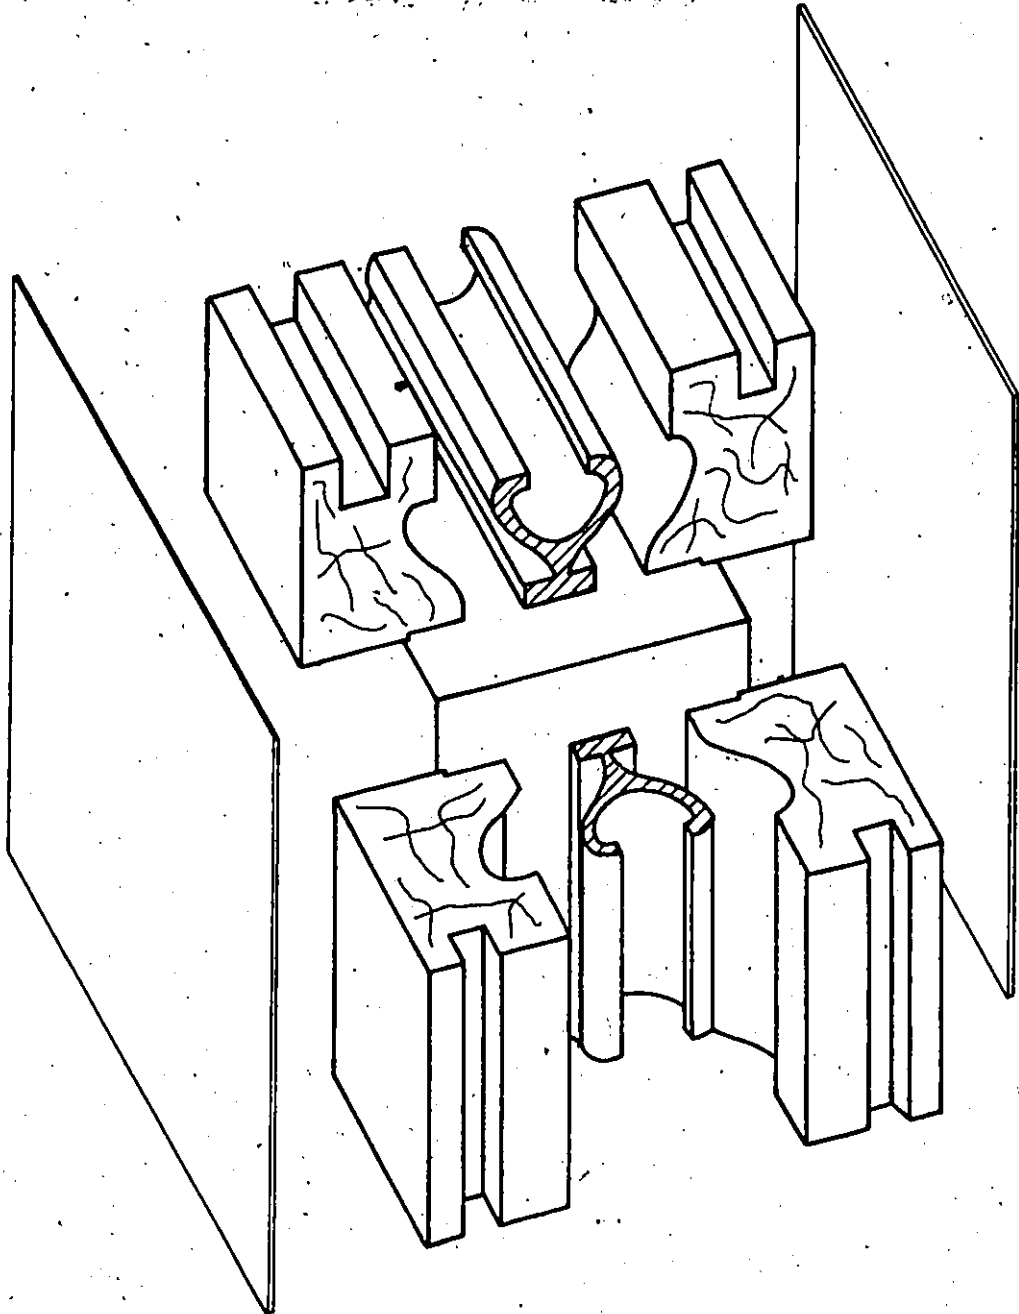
EXPLODED VIEW OF THE FEMALE EXTRUSION AS
